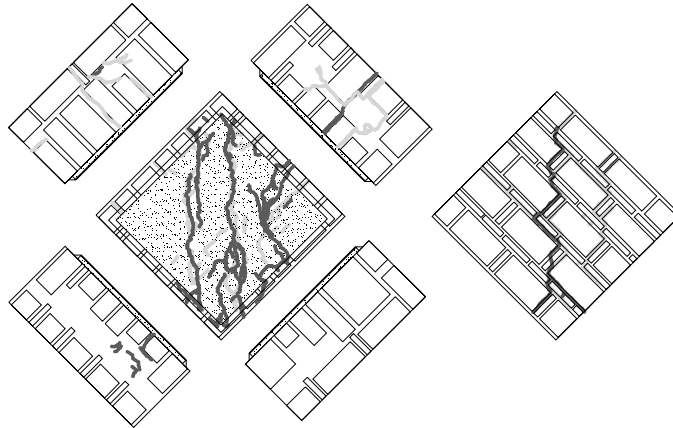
Walette 4, Typical failure mode of wallettes subjected to diagonal compression. Cracks of ungrouted masonry (light grey) and cracks of grouted masonry (dark grey)
